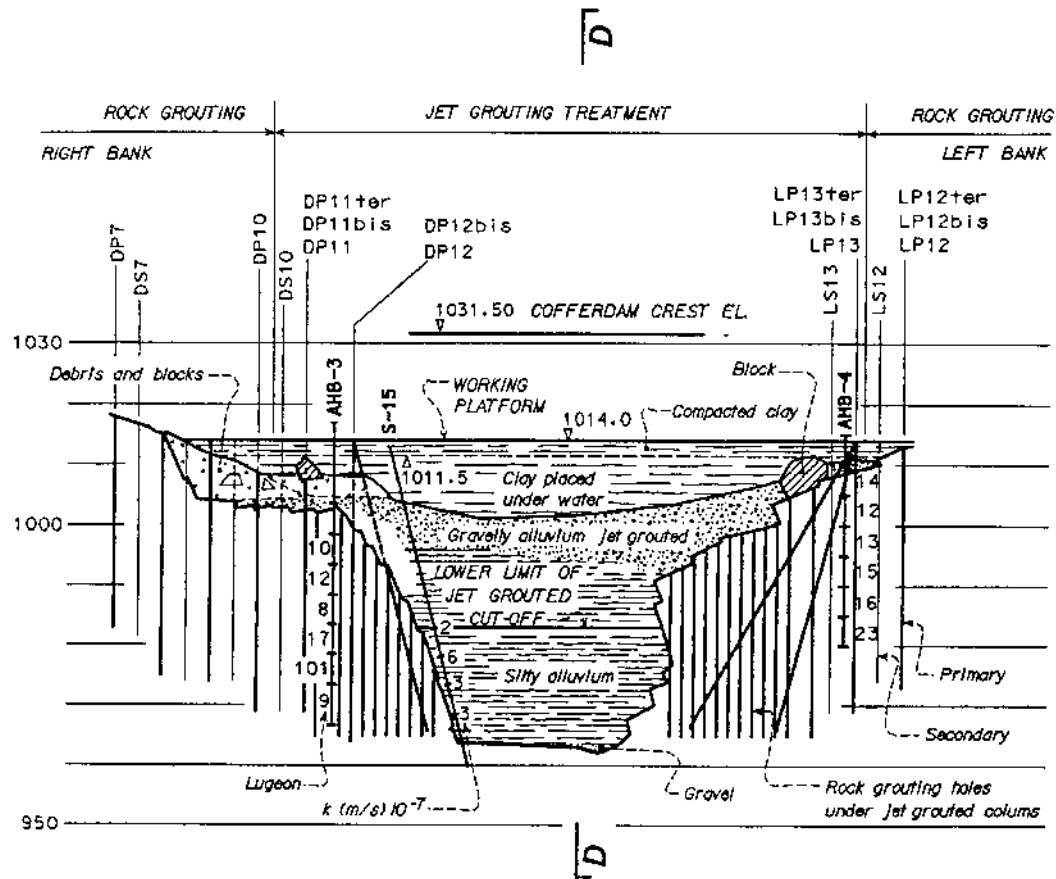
Cross section C-C of valley at the site of the downstream cofferdam (see Fig. 5 for location), showing rock line, extent of jet grouting treatment, and rock treatment by conventional grouting
